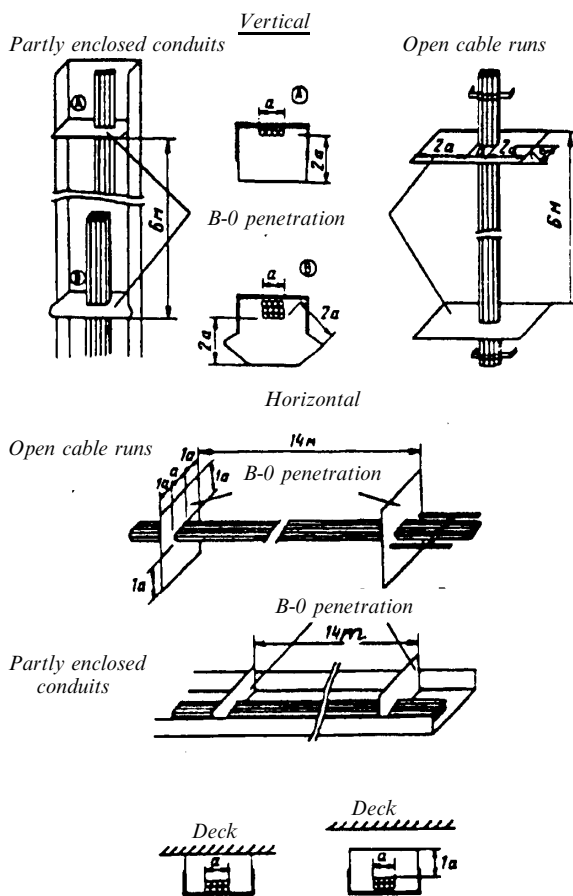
(c) Cable runs protected with B-O fire-retarding divisions
